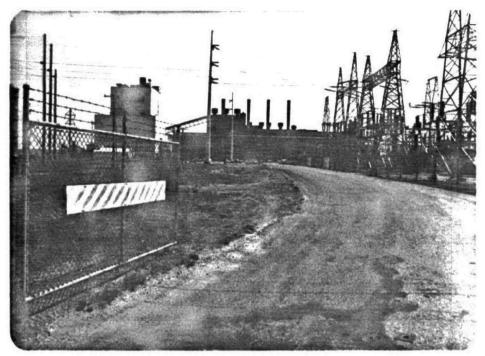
View from ground level at the entrance gate facing east showing the entire plant. Boiler No. 8 is on the left. The brick building houses Boilers 5, 6, and 7.
